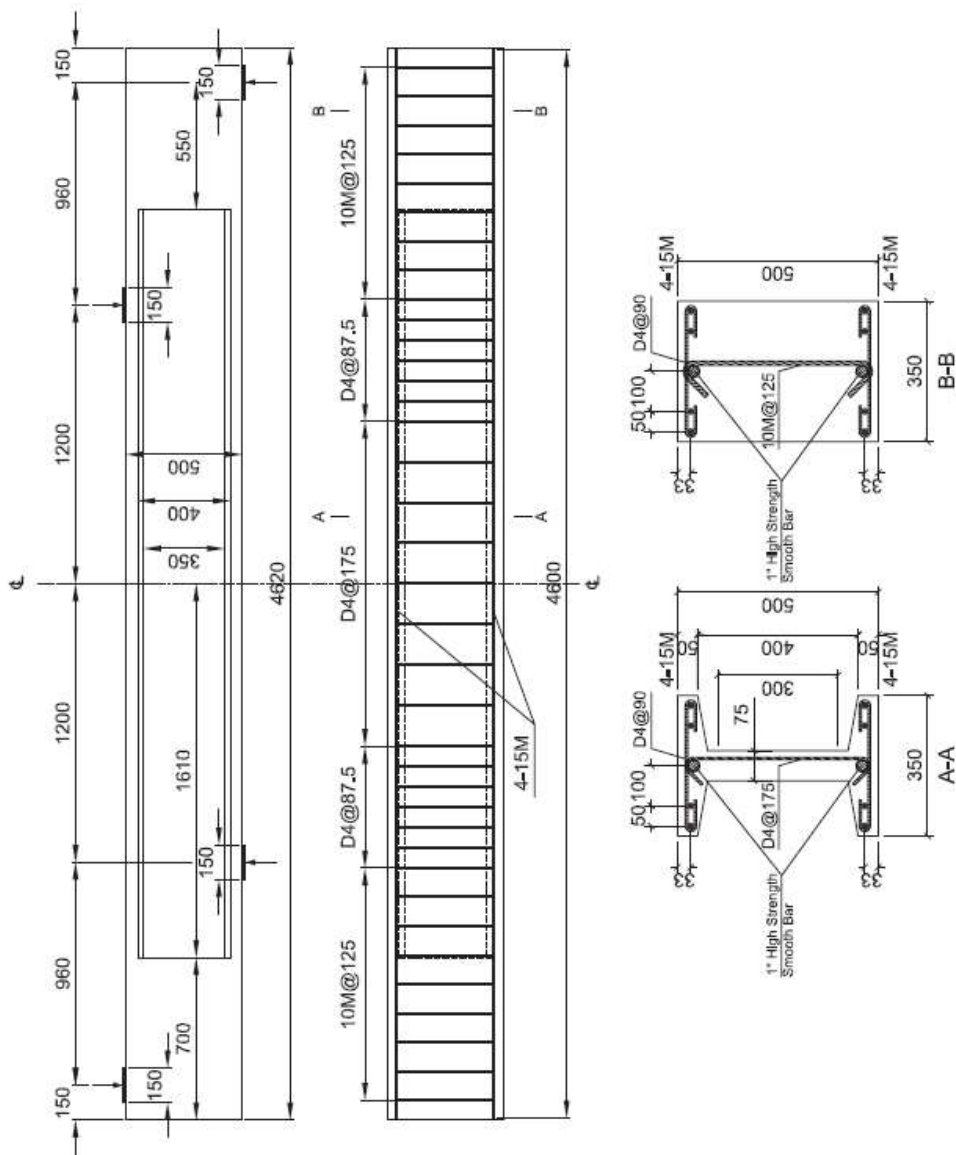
Reinforcement layout. Source: Xie (2009)
